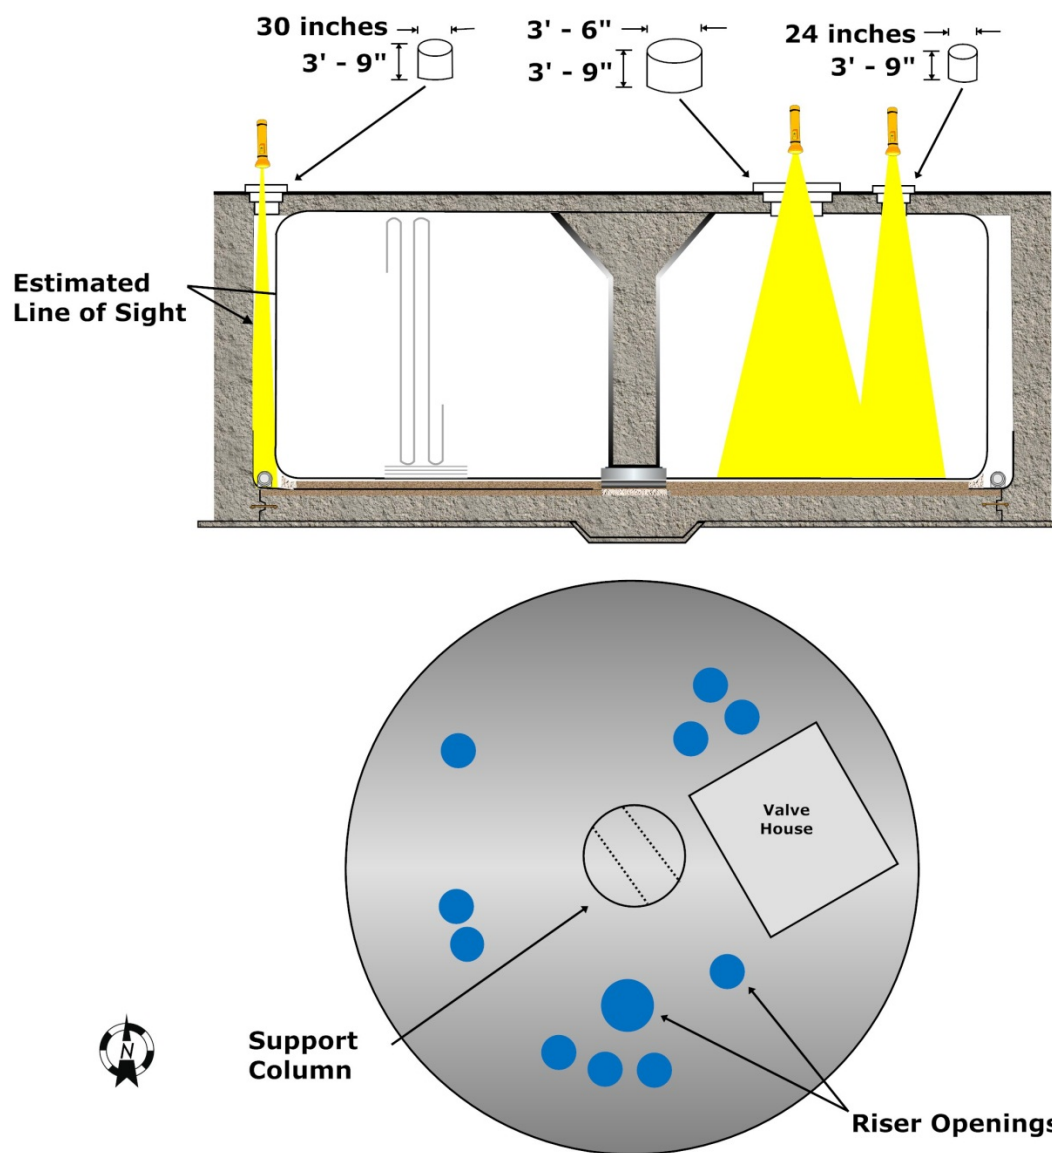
Tank 16 Center Column and Cooling Coils
